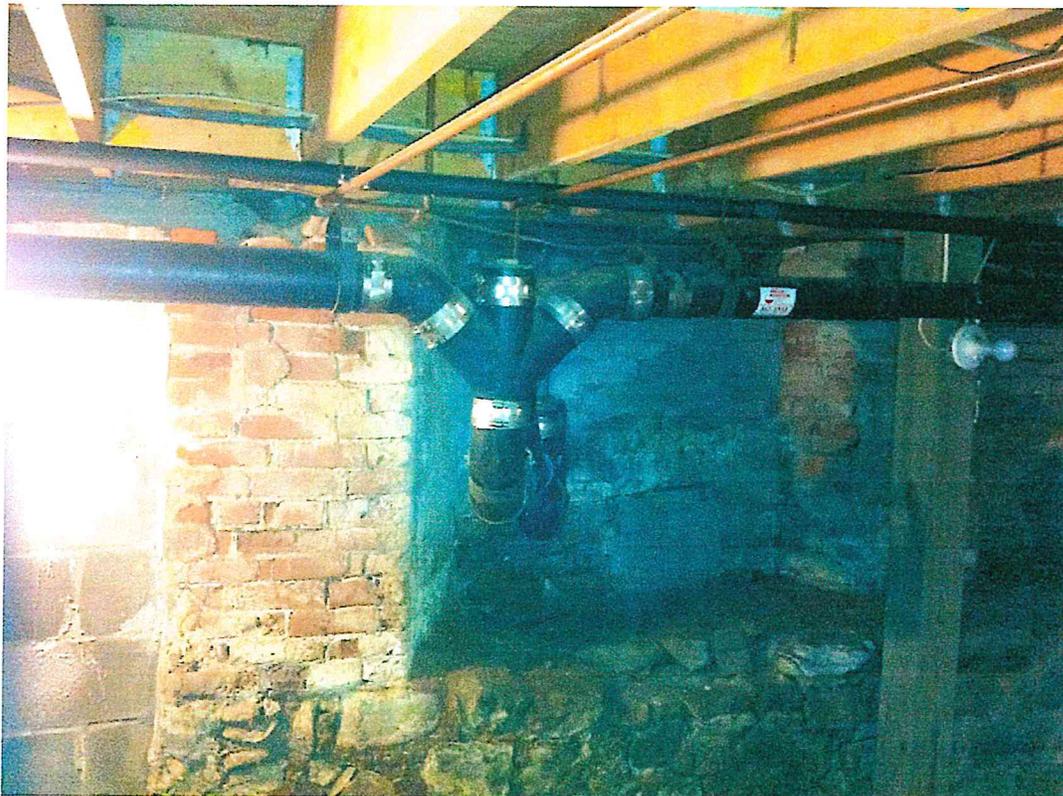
East wall of cellar, showing original on-grade entrance on the left, now blocked with concrete blocks. The pair of windows on the right, provided natural light and display features from the east end, which was fully above grade at this level before 1928. Now sewer lines from the apartments above gather and exit here.
